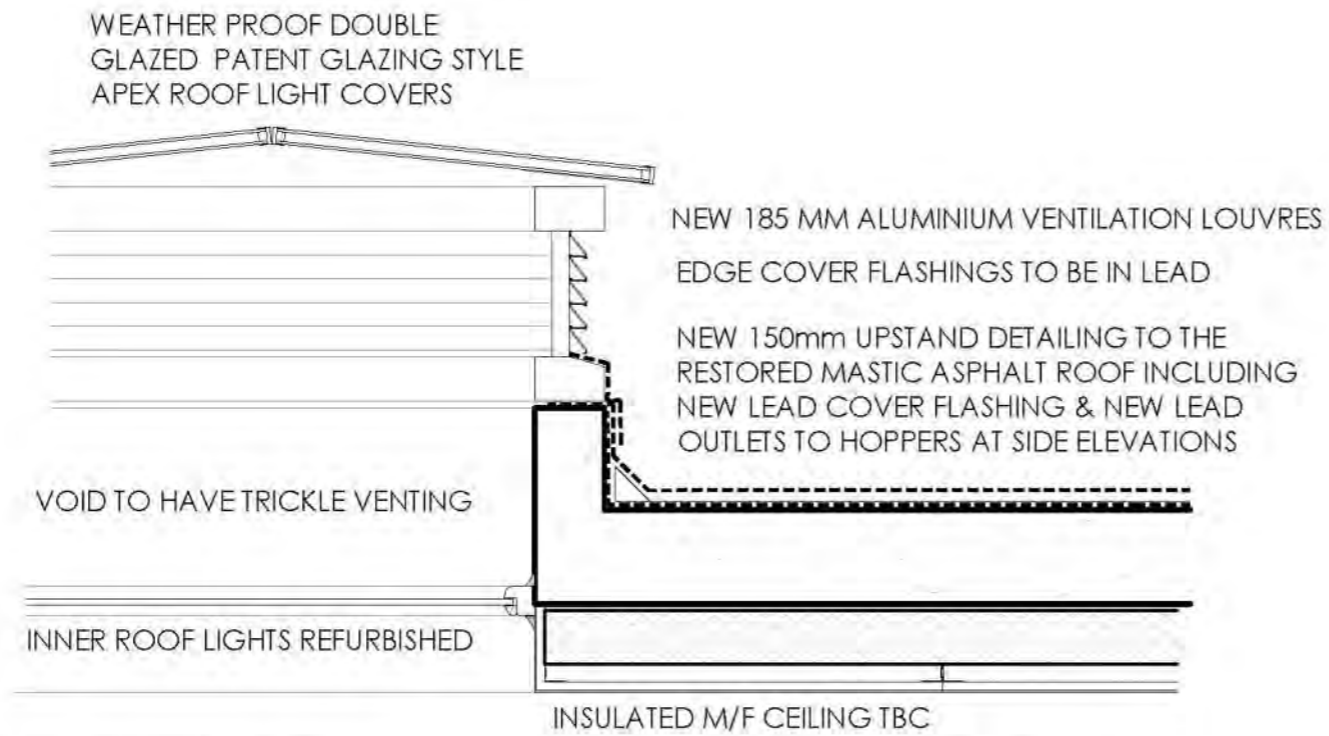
Proposed detail for junction of pitched roof with flat roofs
